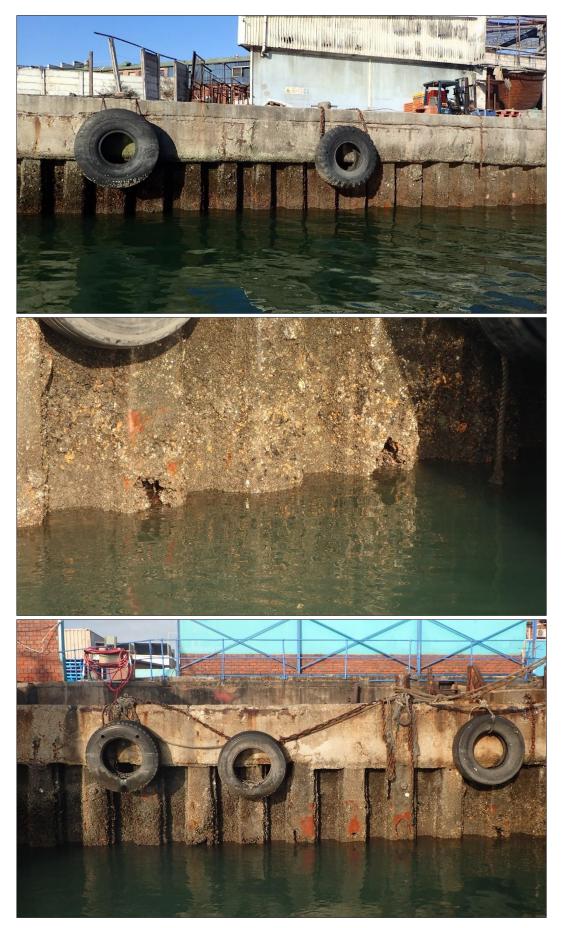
Photographs of part of the existing Old Tug Jetty sheet pile quay wall in the Port of Port Elizabeth. Note the damage to the sheet pile and concrete super structure.
